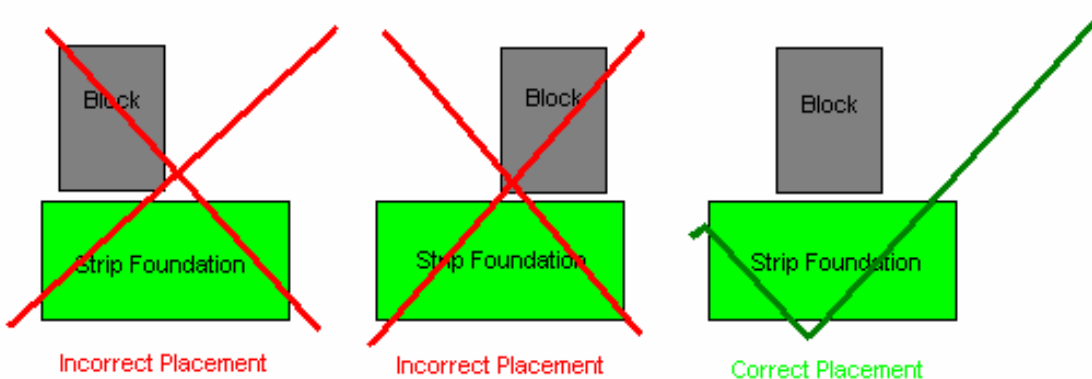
BLOCK PLACEMENT ON FOUNDATION
